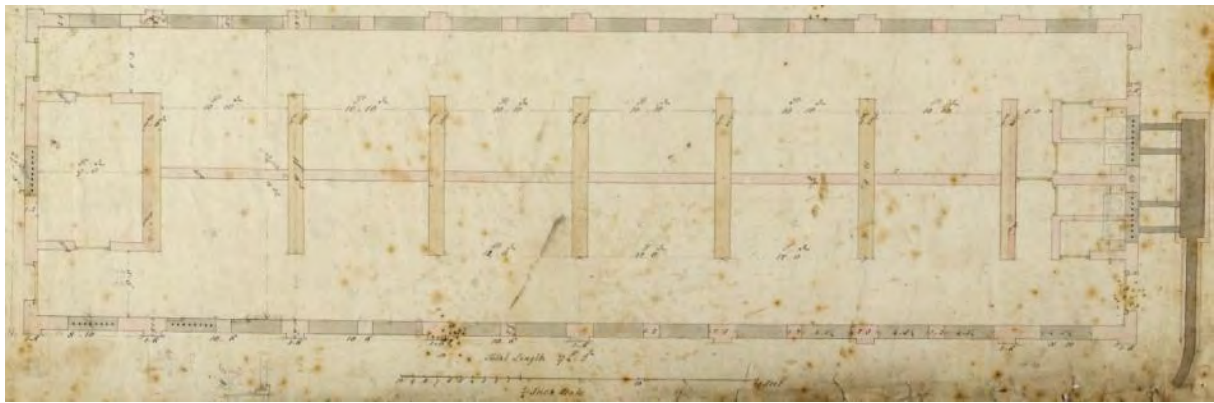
Detailed plan of the treadmill layout from Captain Worsely's 1849 designs for the Northallerton House of Correction
